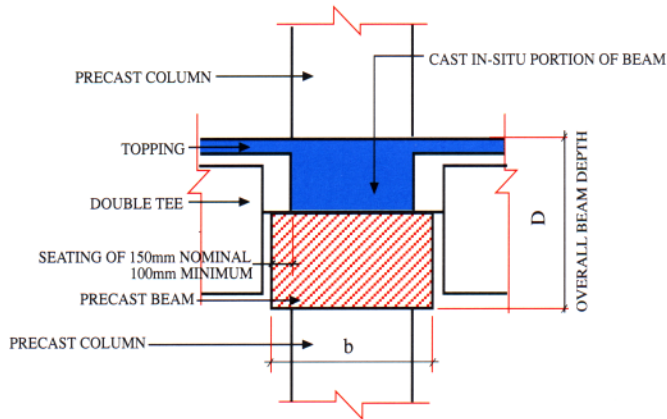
DOUBLE TEE BEAM-SLAB ON PRECAST BEAM
